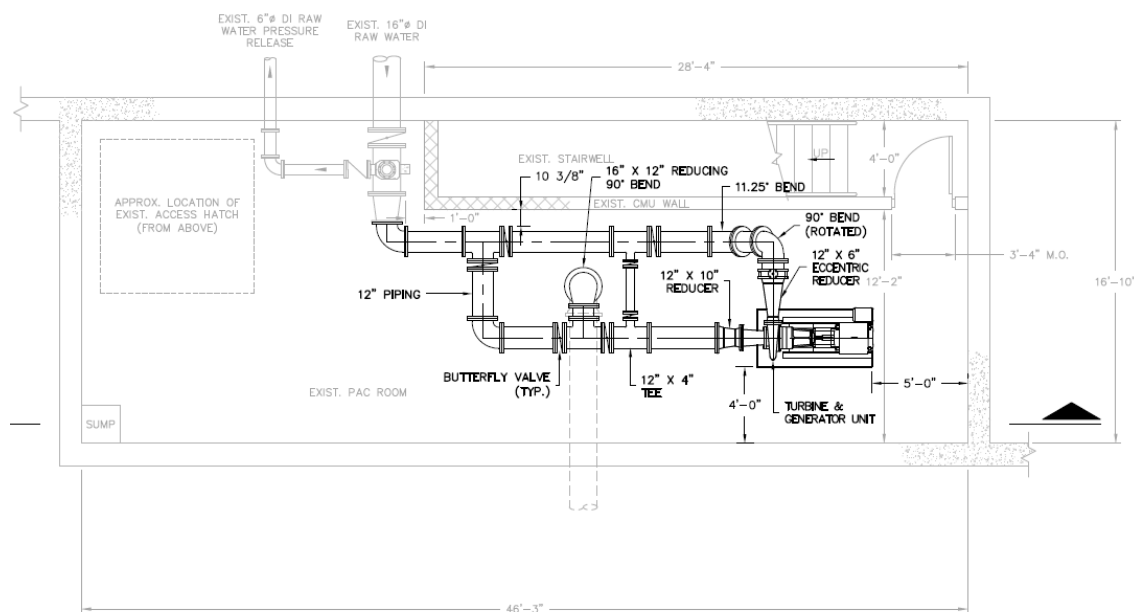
Proposed Sackett Reservoir Hydropower System Plan View
